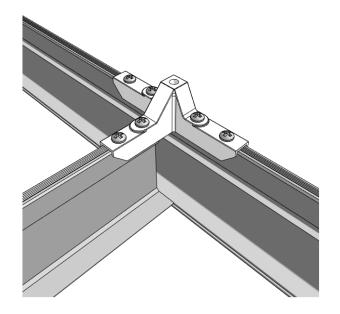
Figure K: Adding Secondary Cross Tees to Support 2x4 Light Fixtures
